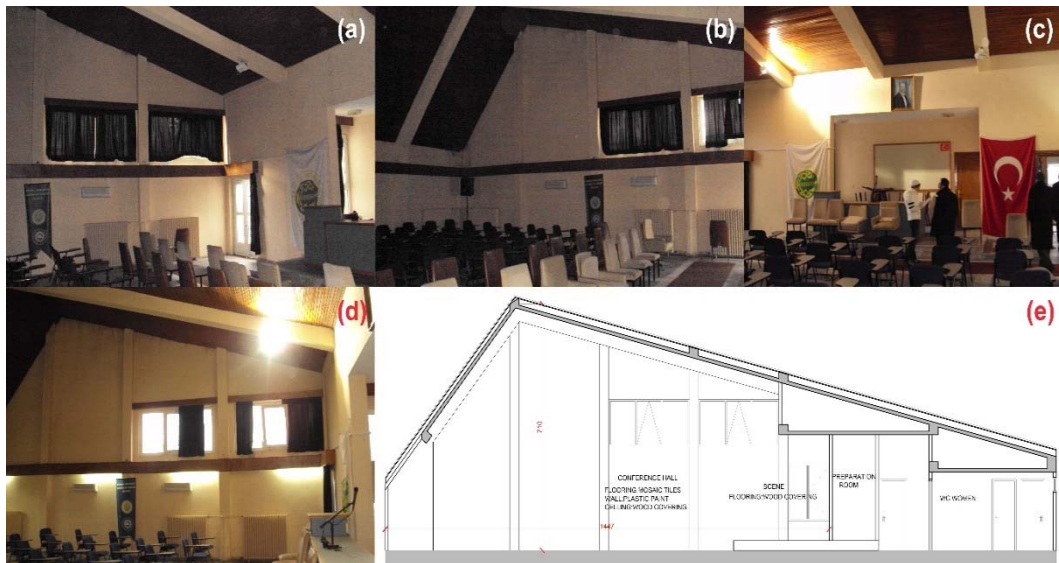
Conference hall building interior photos and section drawing before application (a-e)
